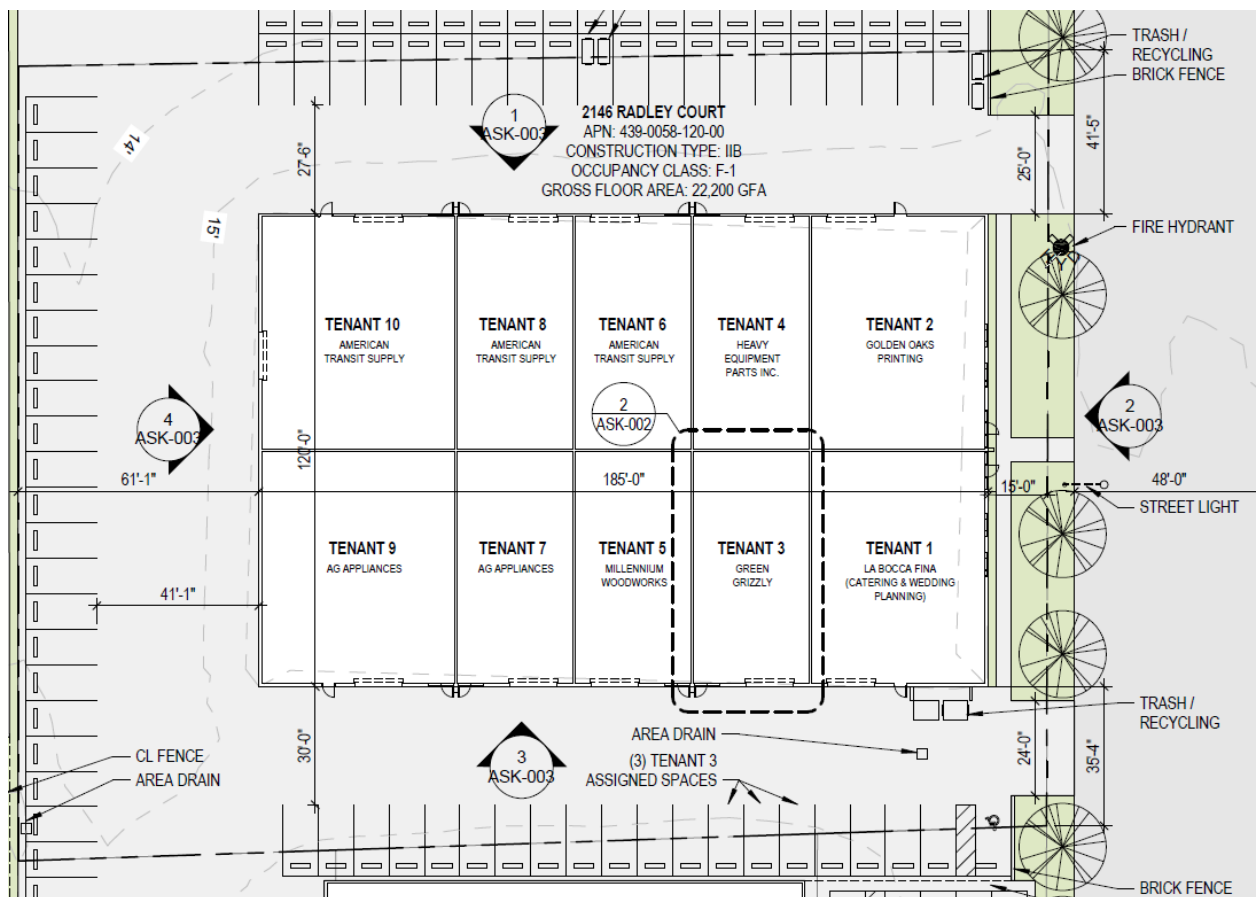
Site plan of 2416 Radley Court showing fire department apparatus access and available fire hydrants
